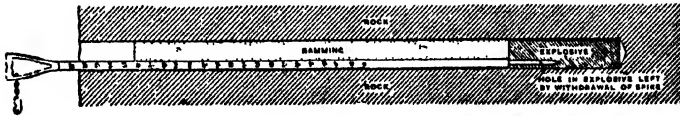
SHOT HOLE RAMMED TO WITHIN 4 INCHES OF MOUTH, INTERNAL ROD AND SPIKE WITHDRAWN, LEAVING CLEAR PASSAGE THROUGH HOLLOW TUBE INTO EXPLOSIVE
